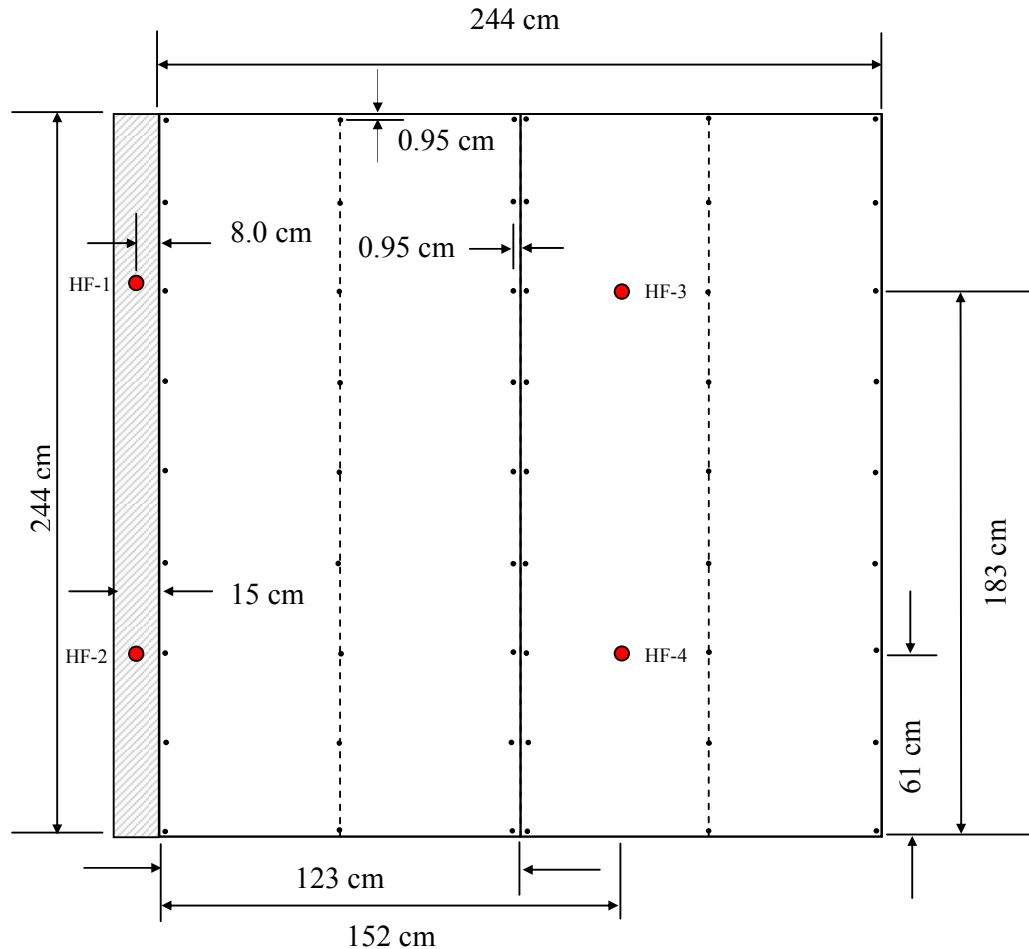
Drawing of Assembly One and Assembly Two construction at the exposed face.
